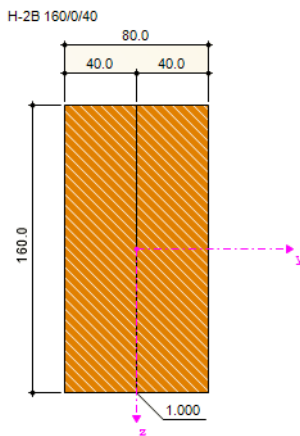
Non built-up timber sections – cross-section tables H-2B, H-3B and 4B
